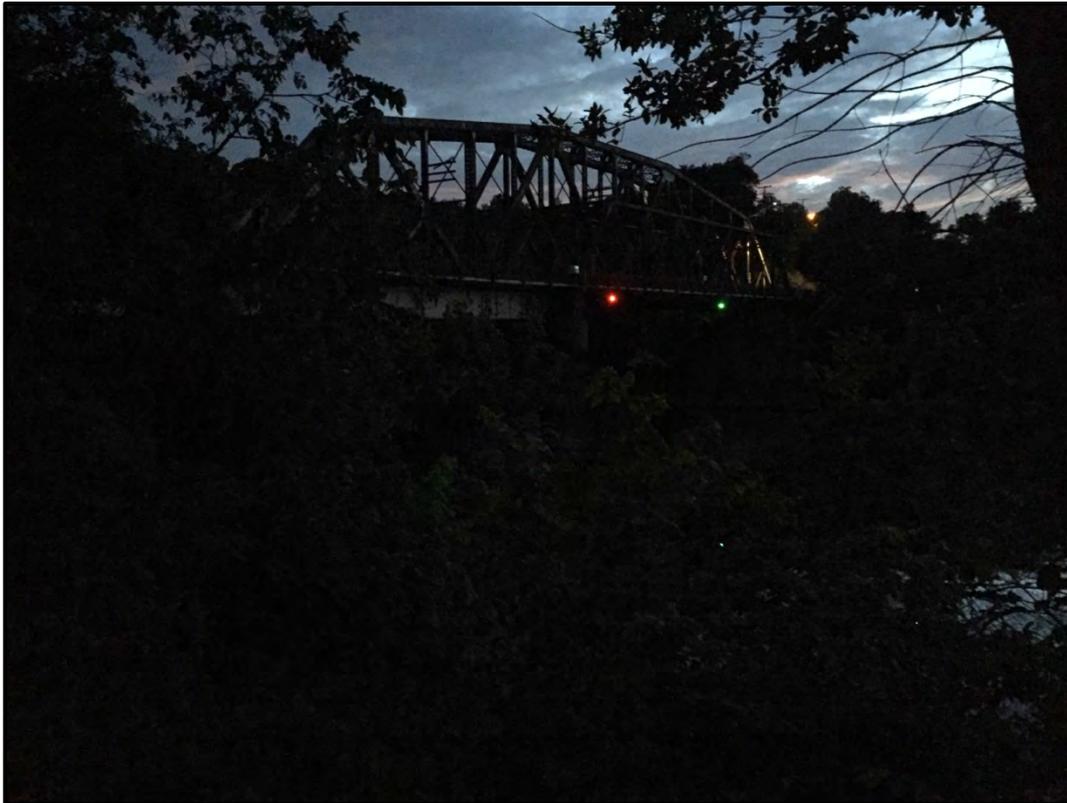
The red light marking Pier 5 and the green light marking the center of the navigation span are illuminated at dusk. The red light marking Pier 6 is not illuminated.
